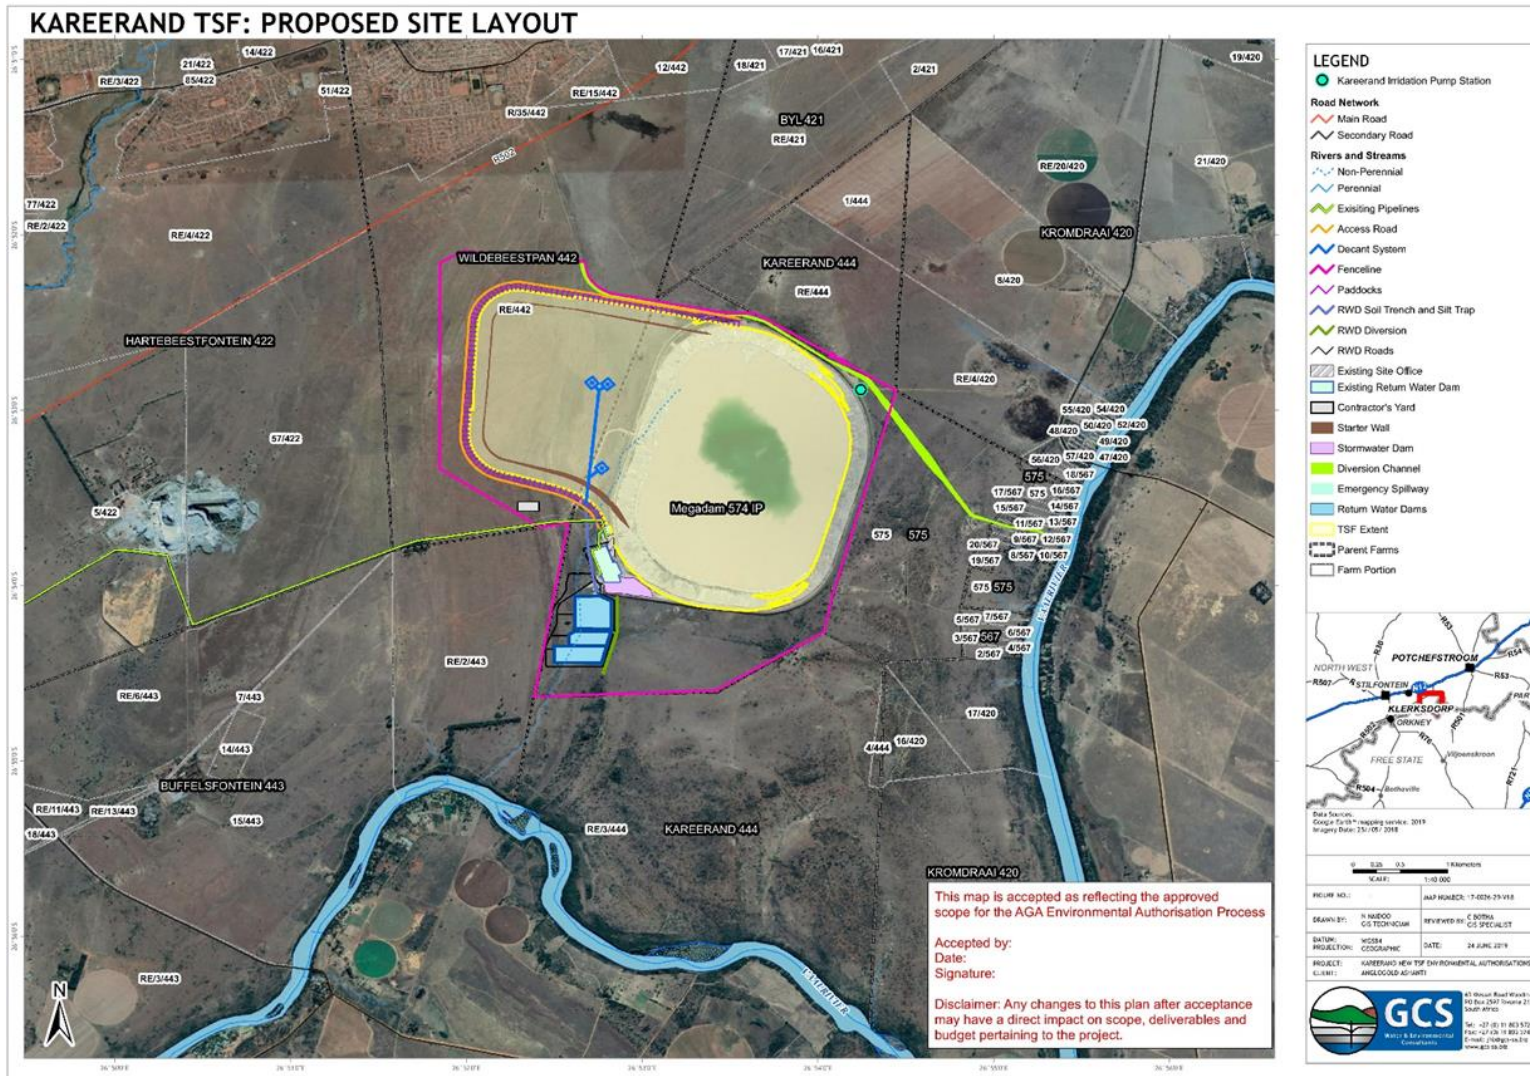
TSF expansion site layout in detail, including associated infrastructure
